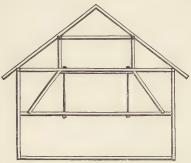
Mode of Framing Truss of Wagon-house, leaving the lower floor clear of all obstructions-20-foot posts.
